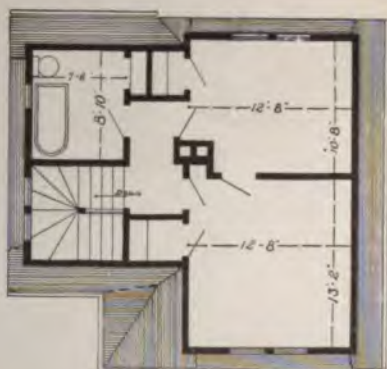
HOUSE FOR EMPLOYEES, PLAN P
